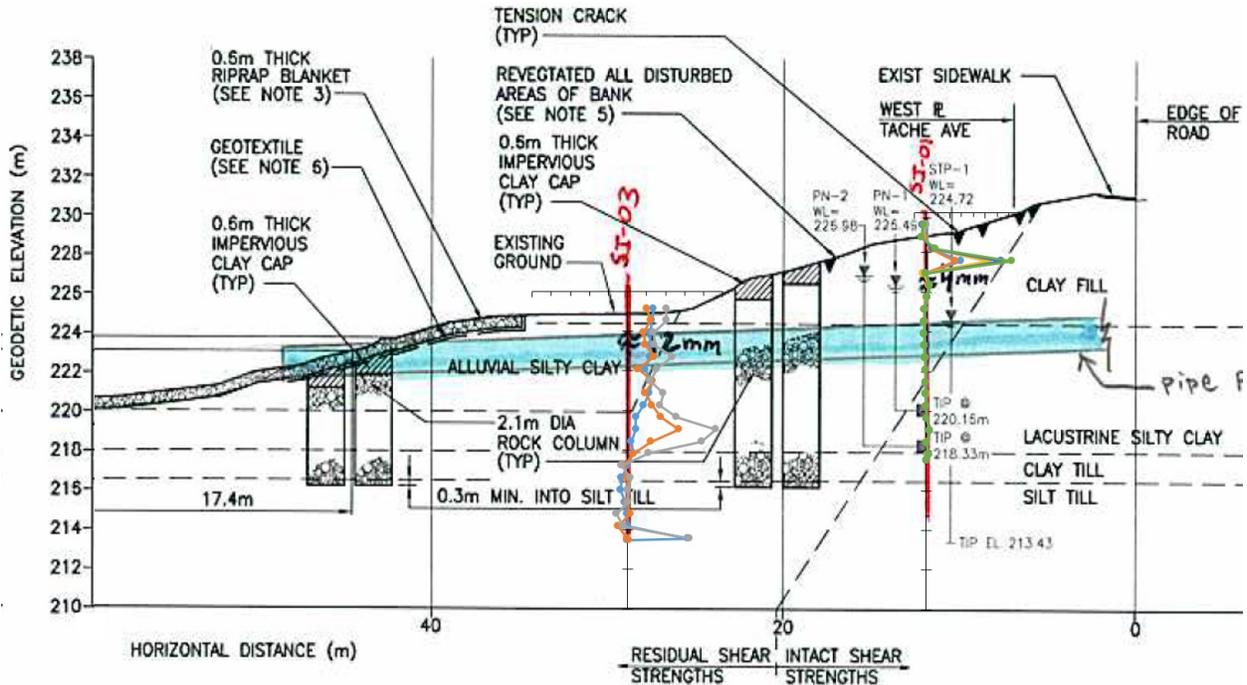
Cross section of the rockfill columns at WP3. The incremental displacement data for SI-03 and SI-01 was superimposed over the cross section. A discrete slip surface can be seen in SI-01 upslope of the rockfill columns and directly downslope to some tension cracks that were identified. SI-03 shows what was interpreted as being this same slip surface, but the surface is no longer as discrete, having crossed through the rockfill columns.
